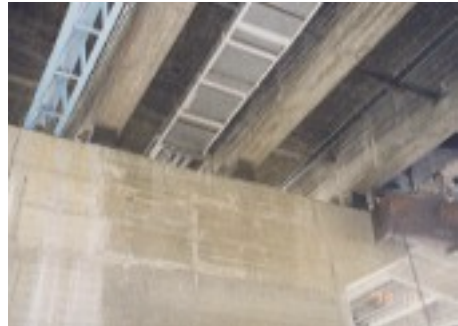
Repair of bearing at Dong-Fon Bridge
